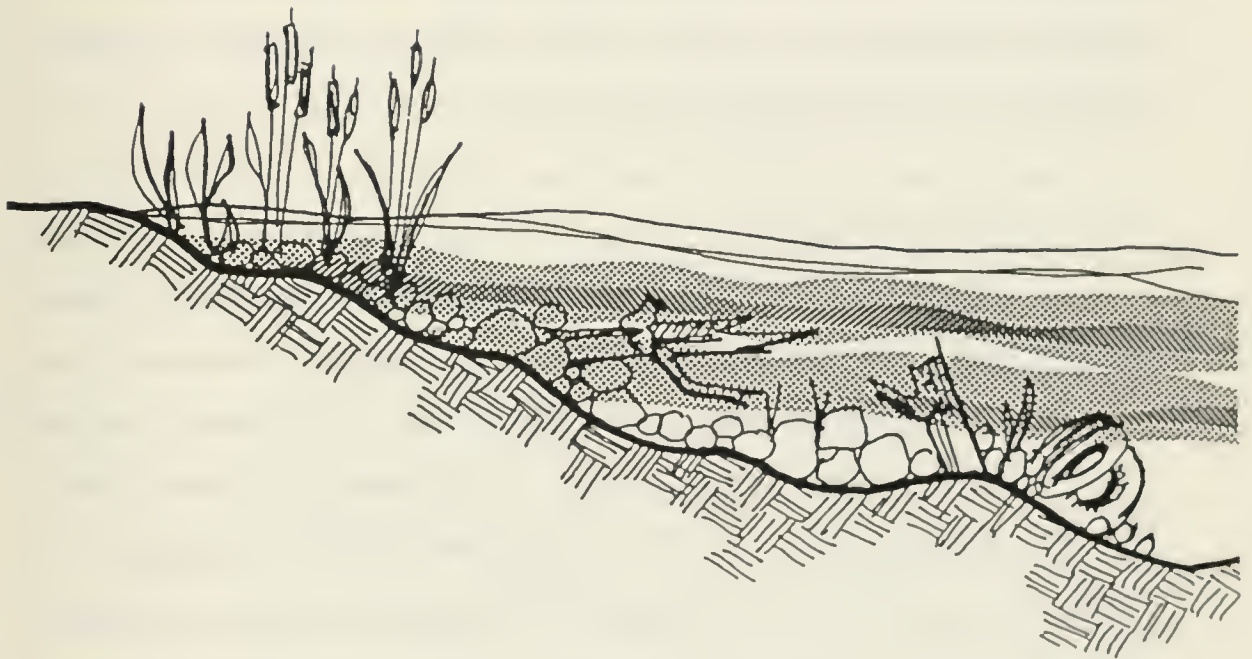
Cross-section of littoral shelf showing placement of large rocks to provide stabilization.
